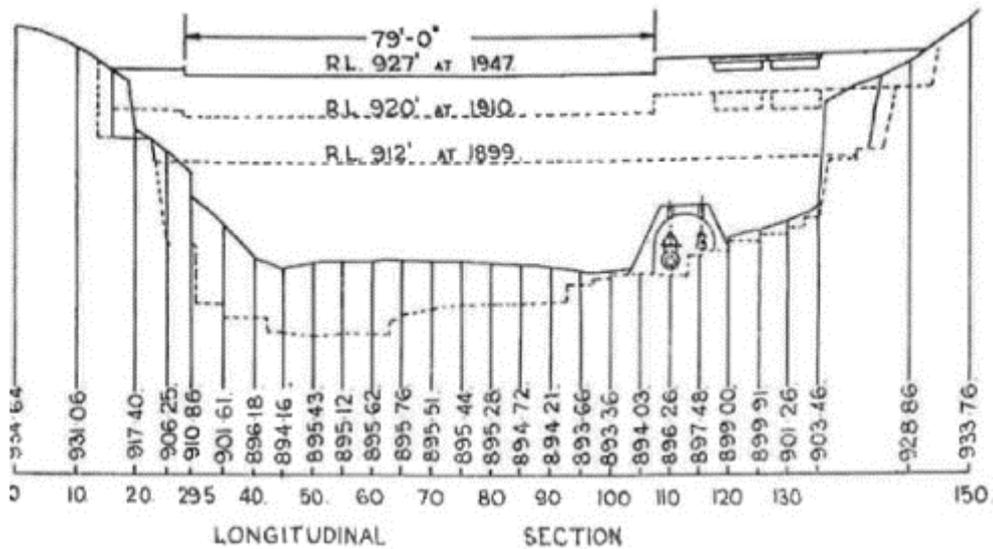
Elevation view from the weir drawing which shows the crest level at each stage
